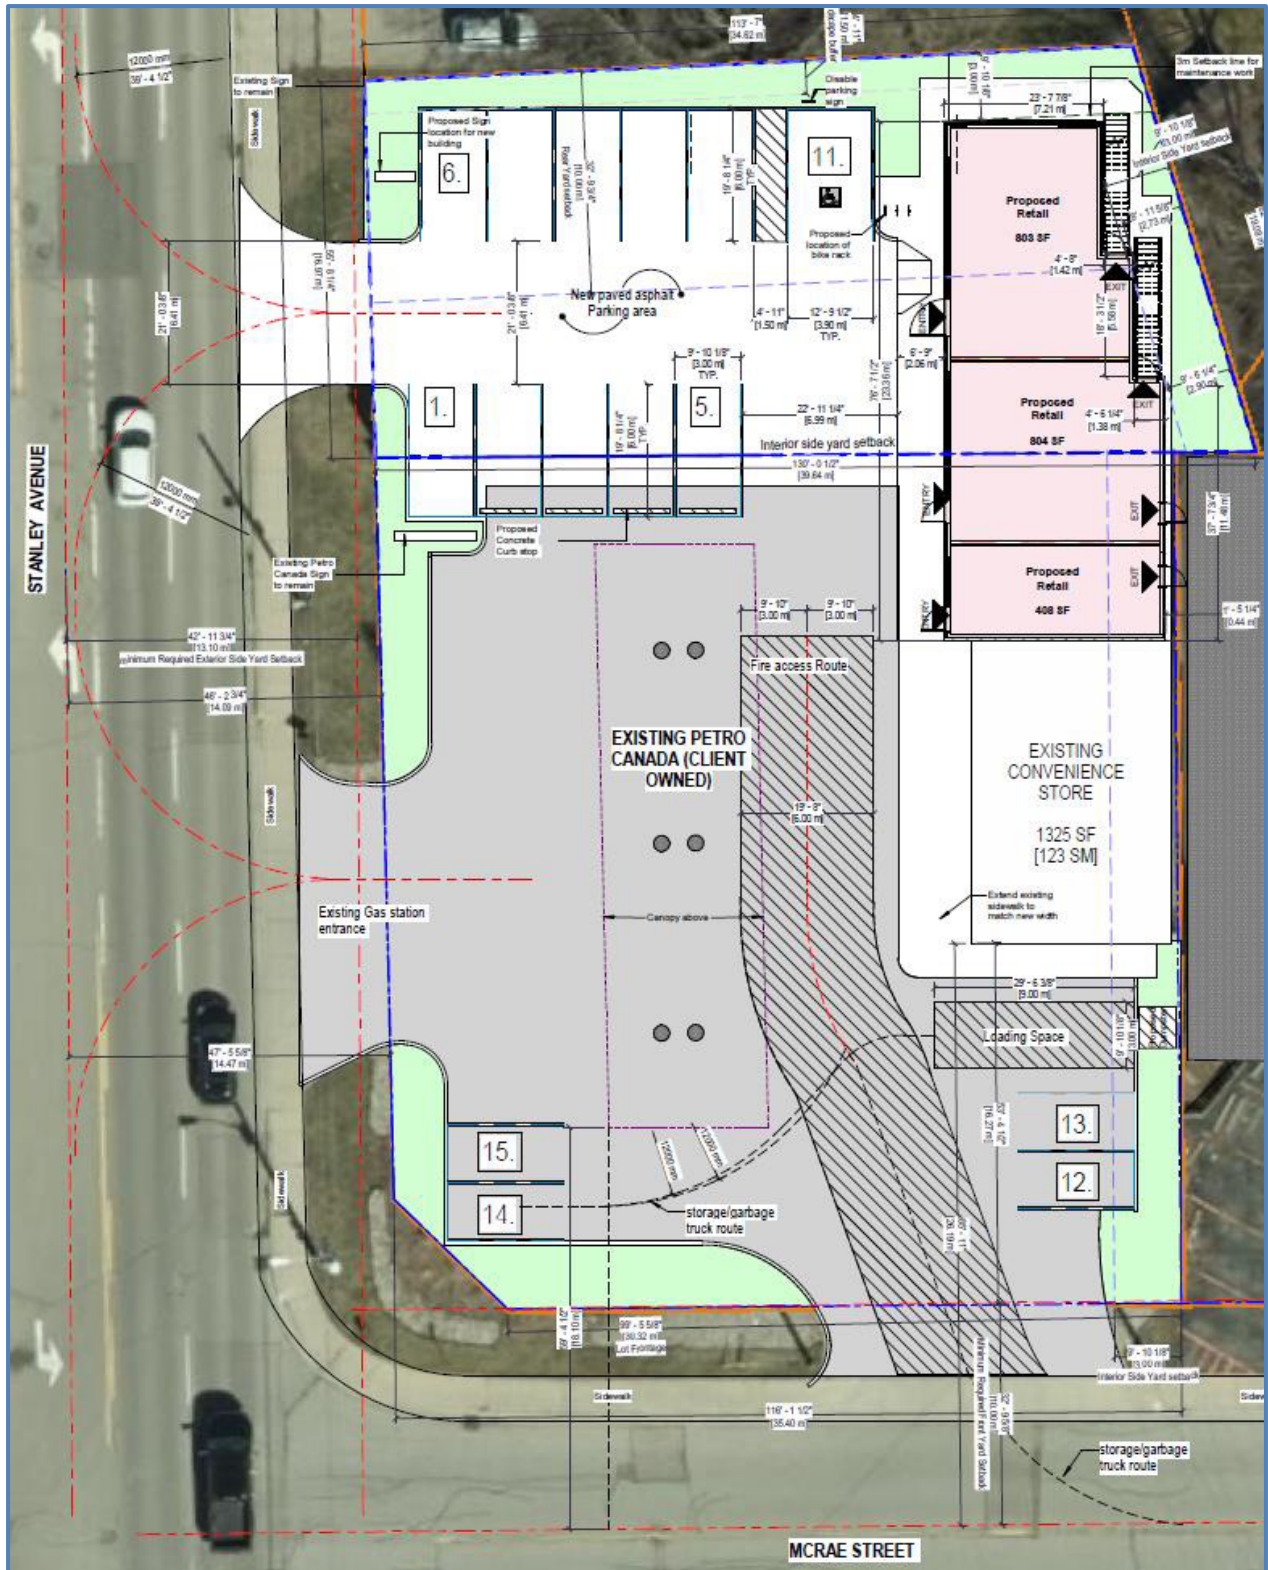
Conceptual Site Plan for Proposed Development (Source: Raimondo + Associates Architects Inc.)
